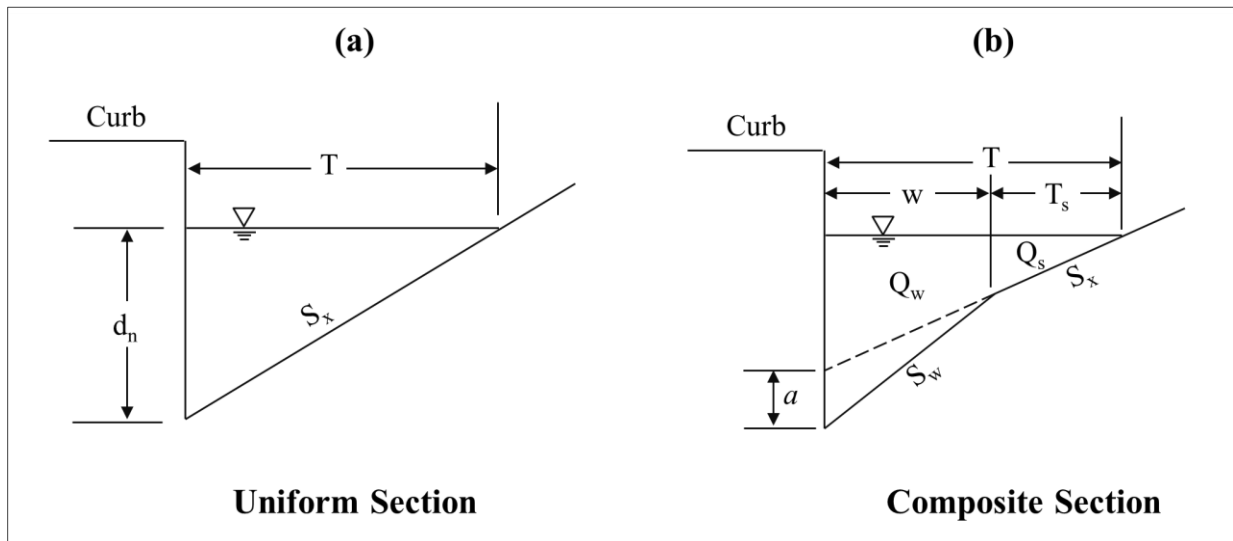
Roadway sections: (a) uniform section, (b) composite section.
